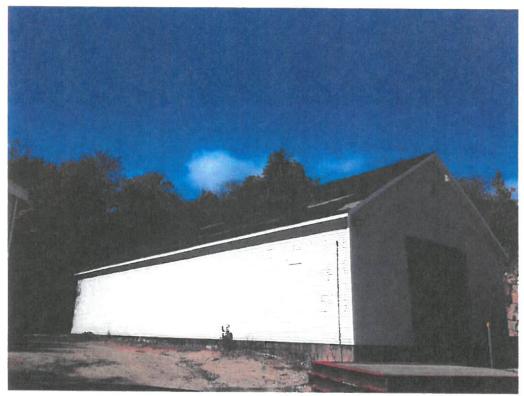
Pinkham 113 – Front and Side Elevation, Roof in disrepair.
